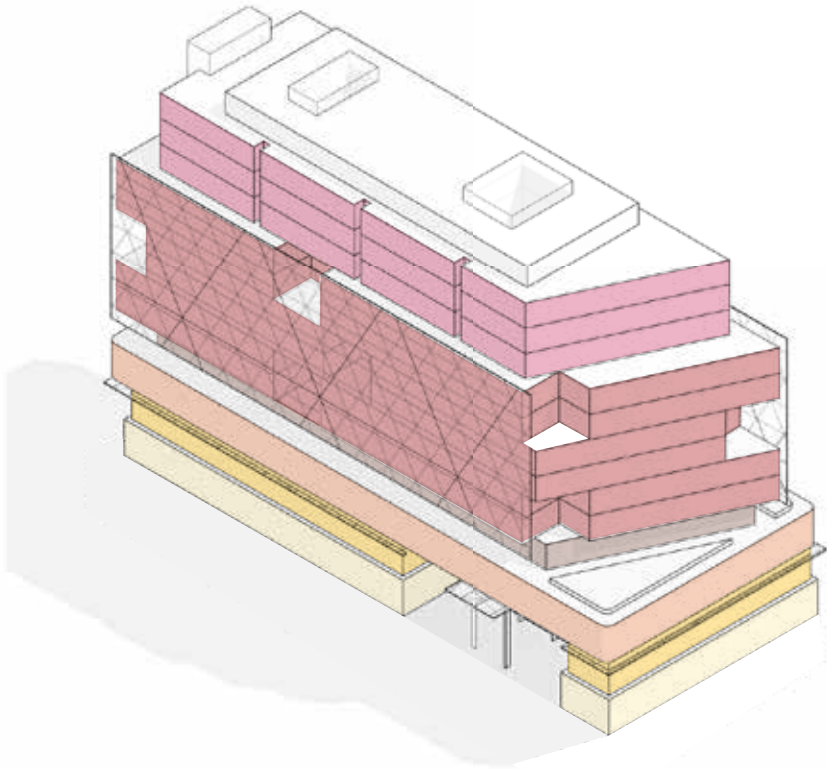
Indicative building section (Adopted from Team 2 Architects)
